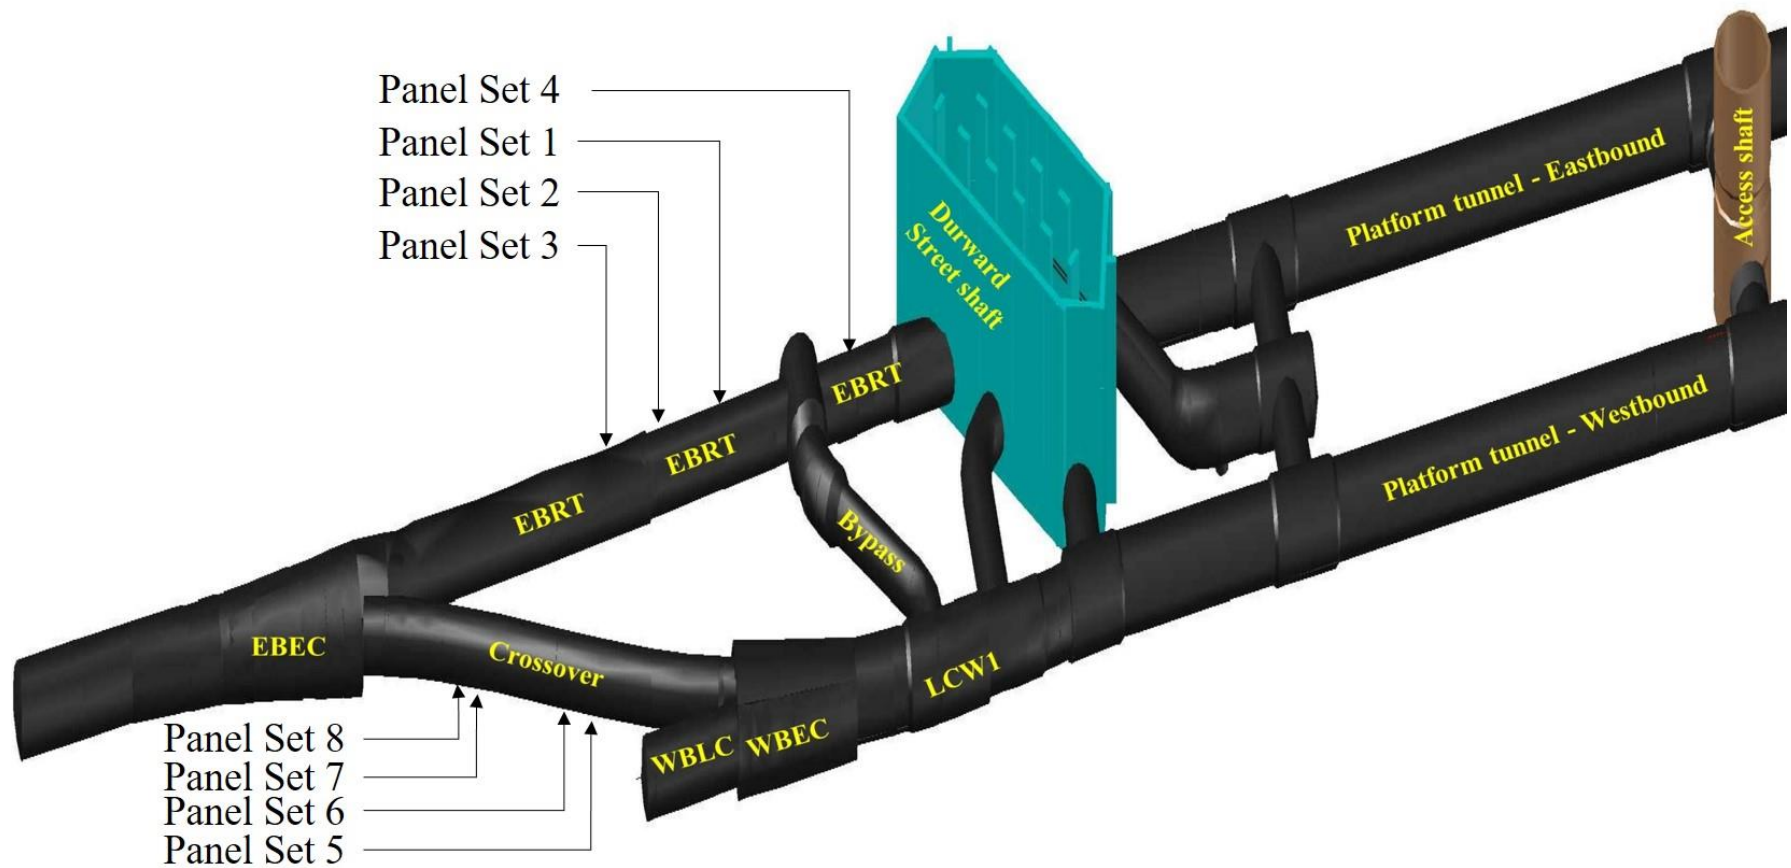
Whitechapel station construction layout (Picture courtesy BBMV) showing test panels' spray locations
